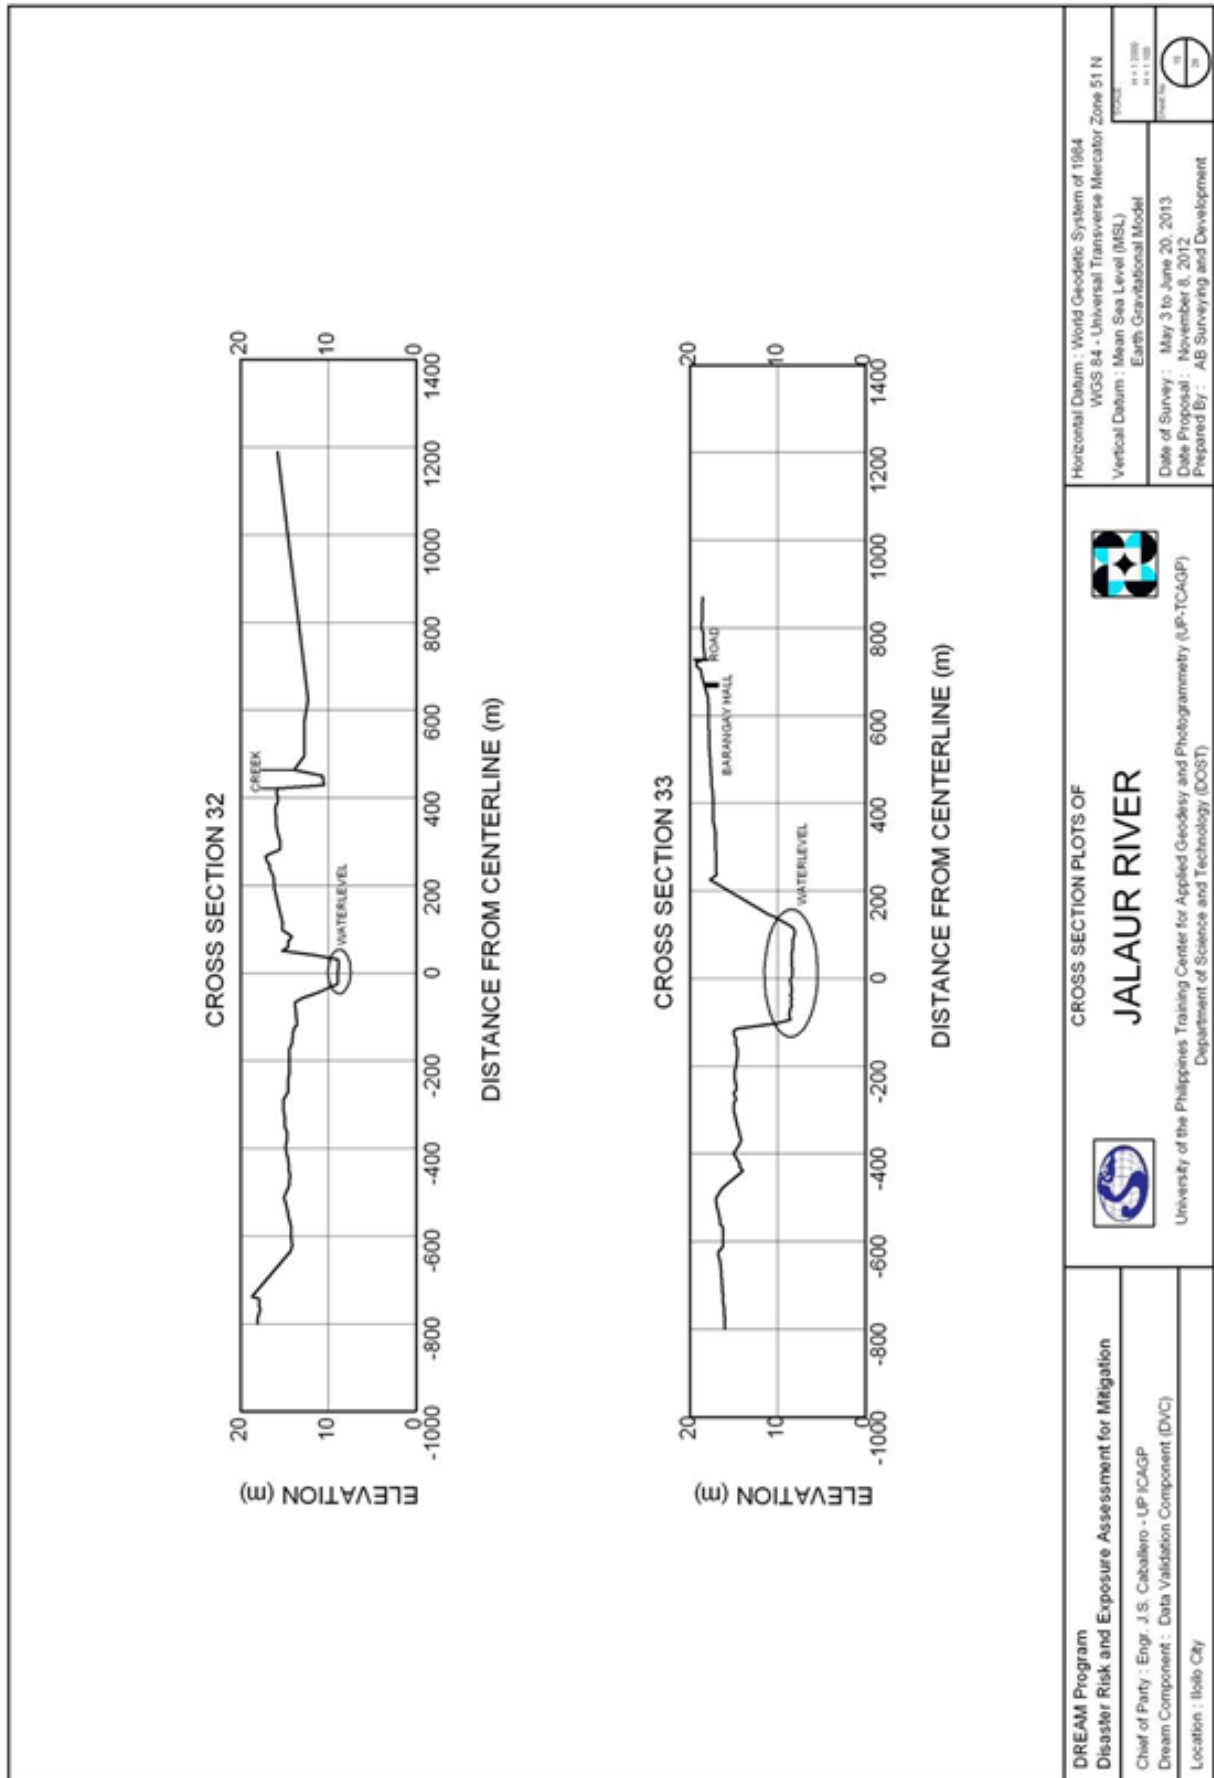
Sheet No.15 of the Cross-section plan of Jalaur River
